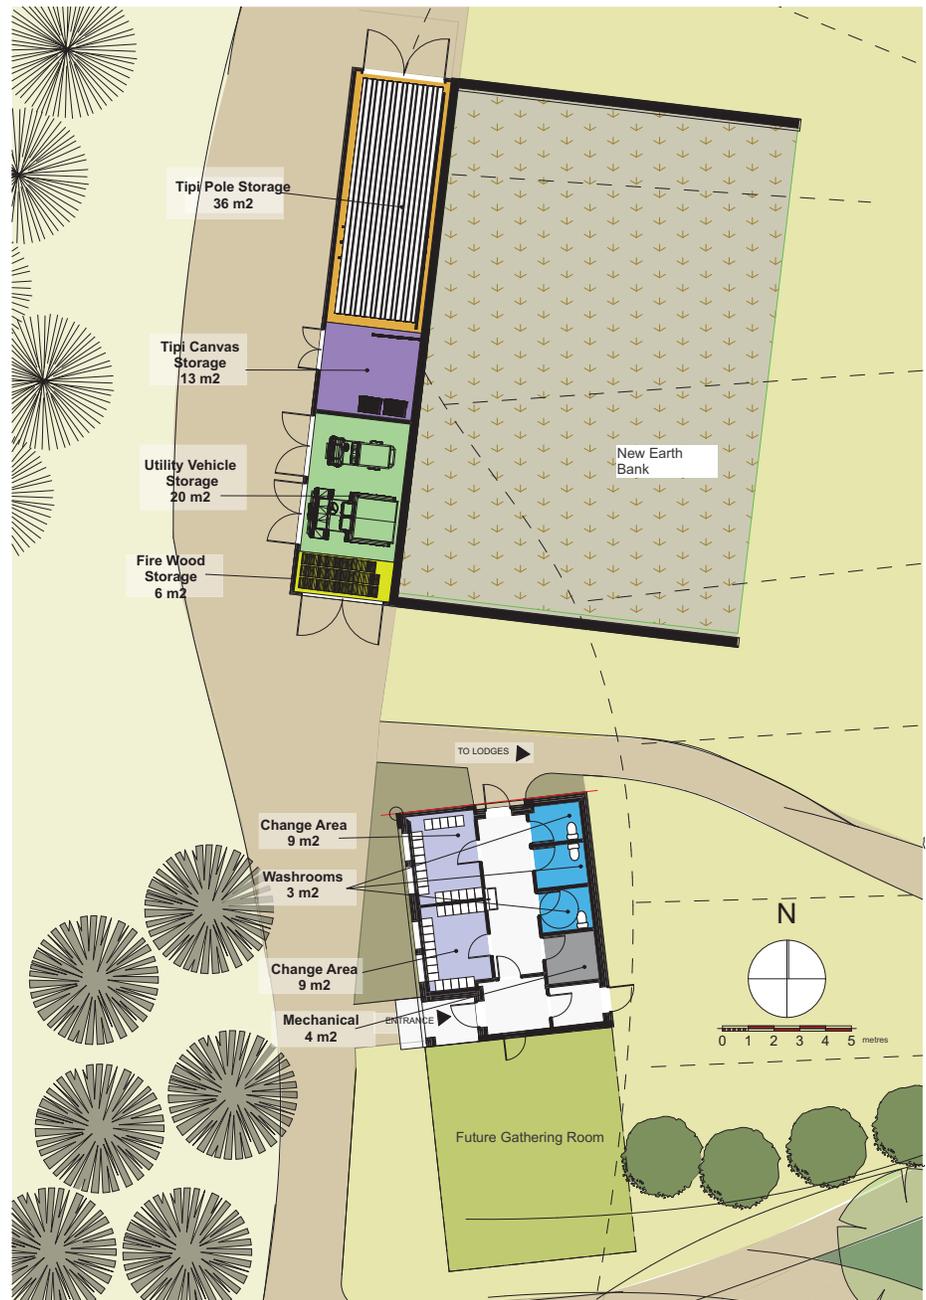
Schematic Diagram of Storage and Washroom/Change Room Buildings
